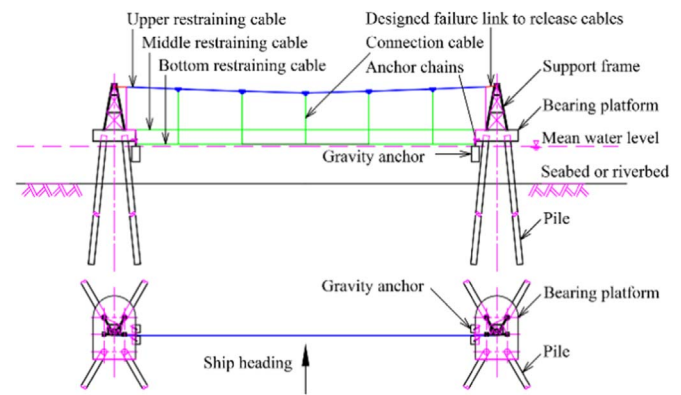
Front elevation and plan of a single unit of overhead retardation system.
